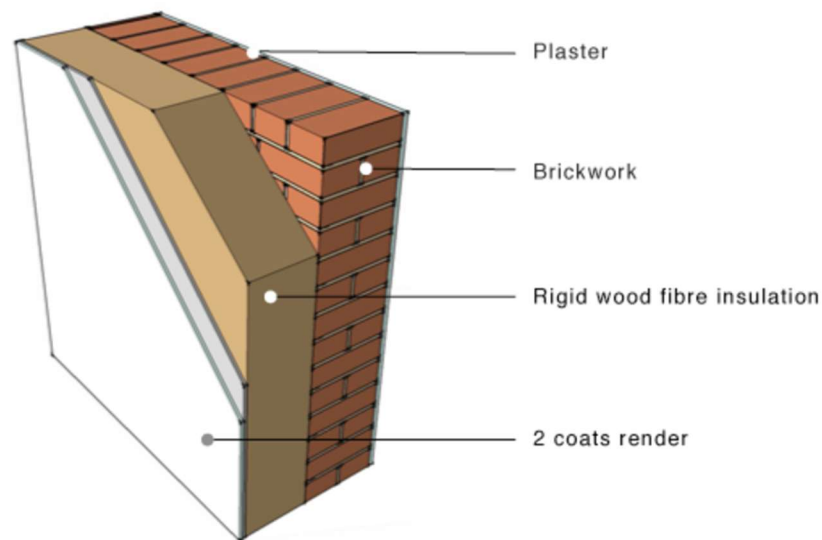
Rigid high-density wood fibreboard installed externally in a masonry wall. Source: Green Spec.
